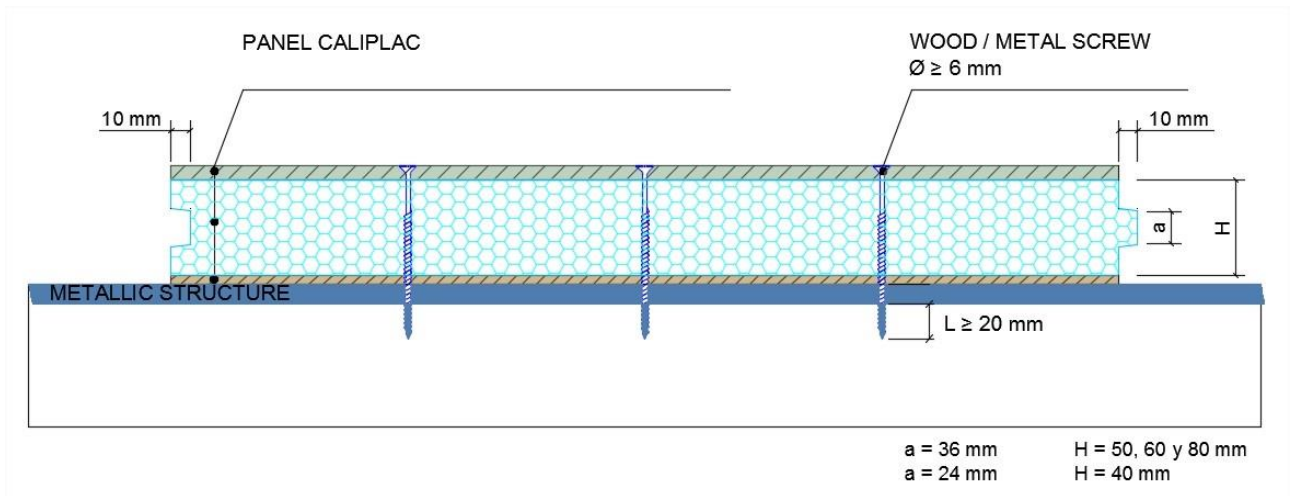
Metallic screw disposition for metallic supports and detail of tongue-and-groove joint
